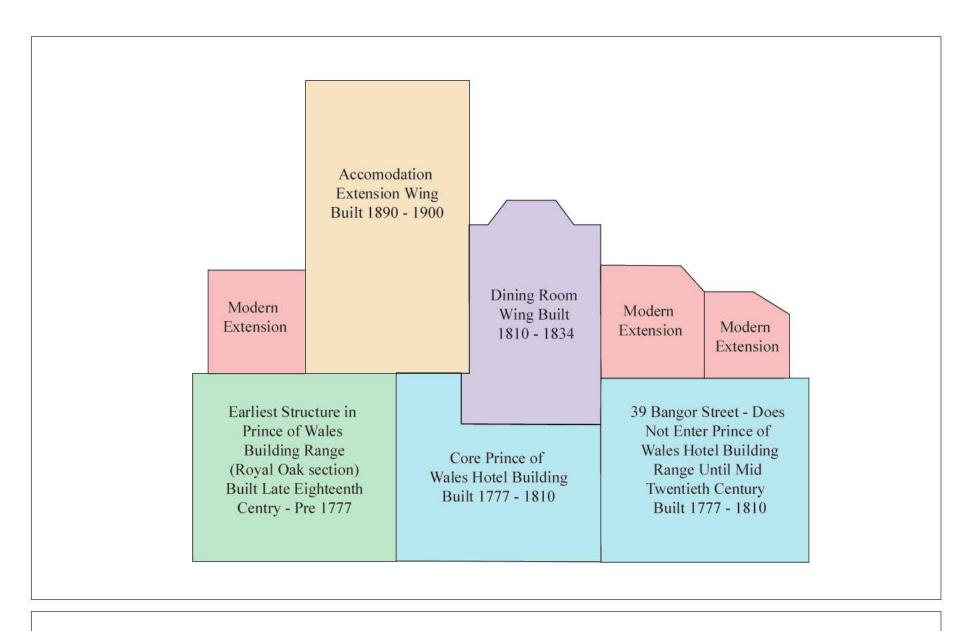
Broad Phasing/ Dates of Buildings in Existing Prince of Wales Building Range
